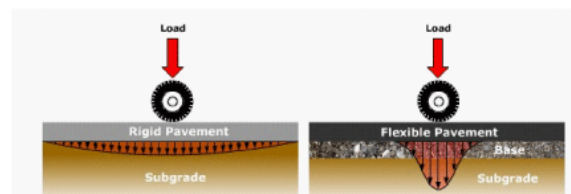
Typical stress distributions under a rigid and a flexible pavement
